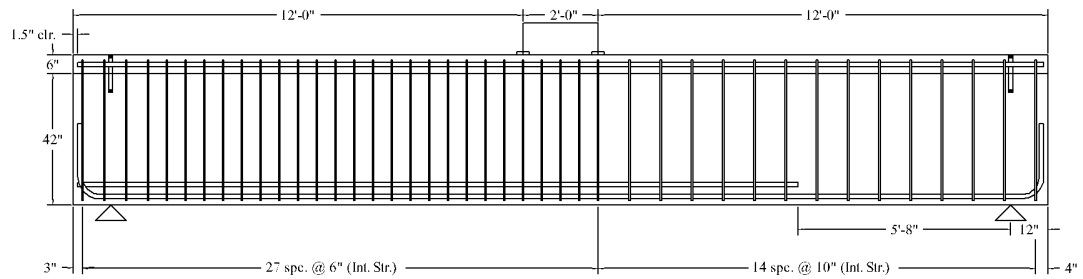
Elevation of specimen T.0.Ld3.(5)
